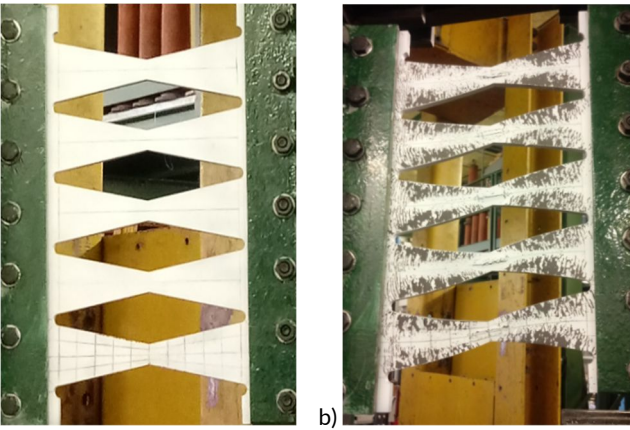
Photo of Specimens A5: a)Start of the test,b) Fracture-end test
